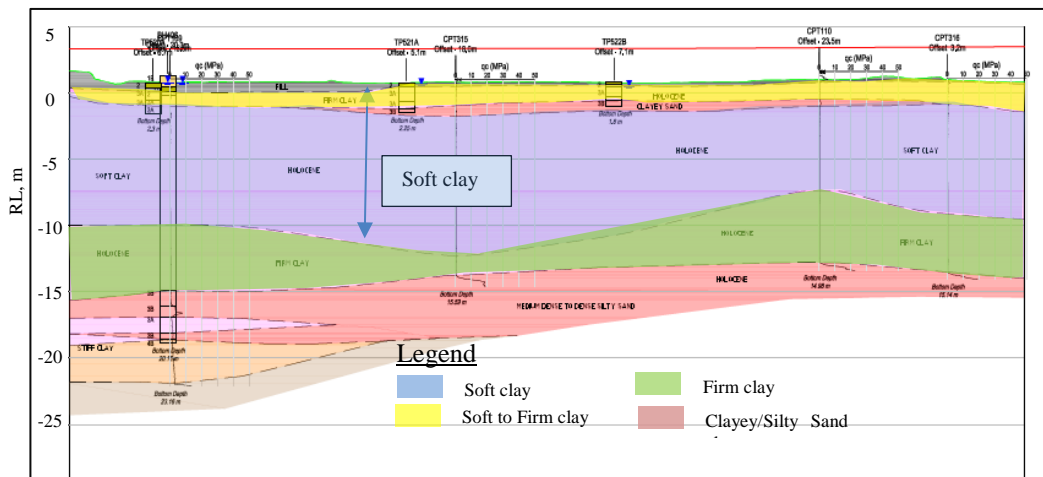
Geological long section developed based on site investigation data (typical section of the site)
